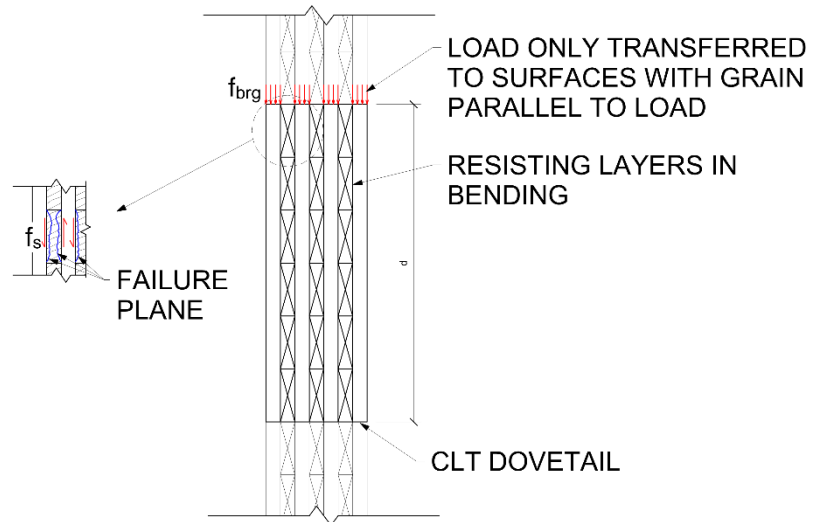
Rolling shear failures on 3-layer CLT floor panel
